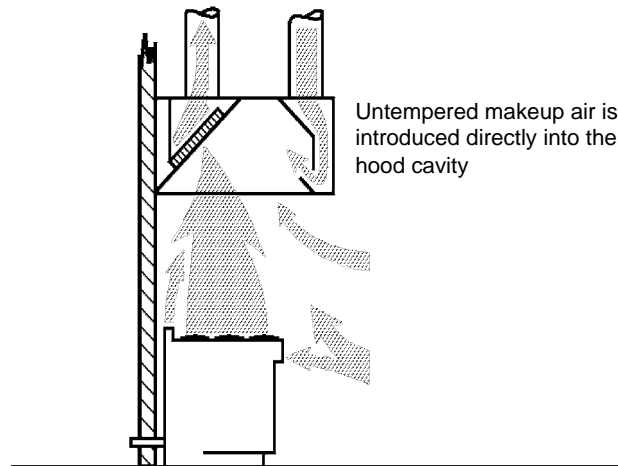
Cross-Section of Wall-Mounted Canopy Hood with Short-Circuit MUA Theoretically Working Properly
